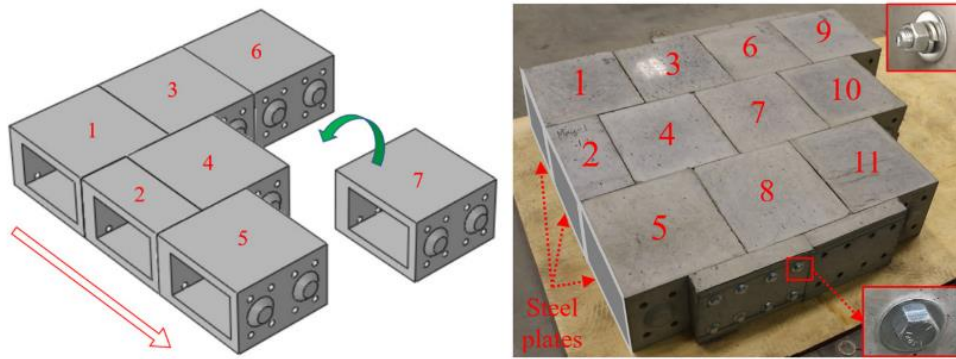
Lego inspired concrete blocks extracted from (Bao and Li, 2020)
